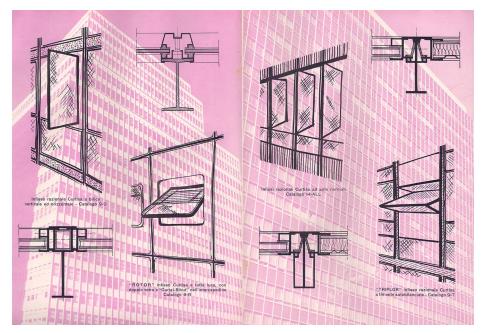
Examples of the application of *Curtisa* window frames to the curtain wall system (source: *Curtisa* catalogue)
